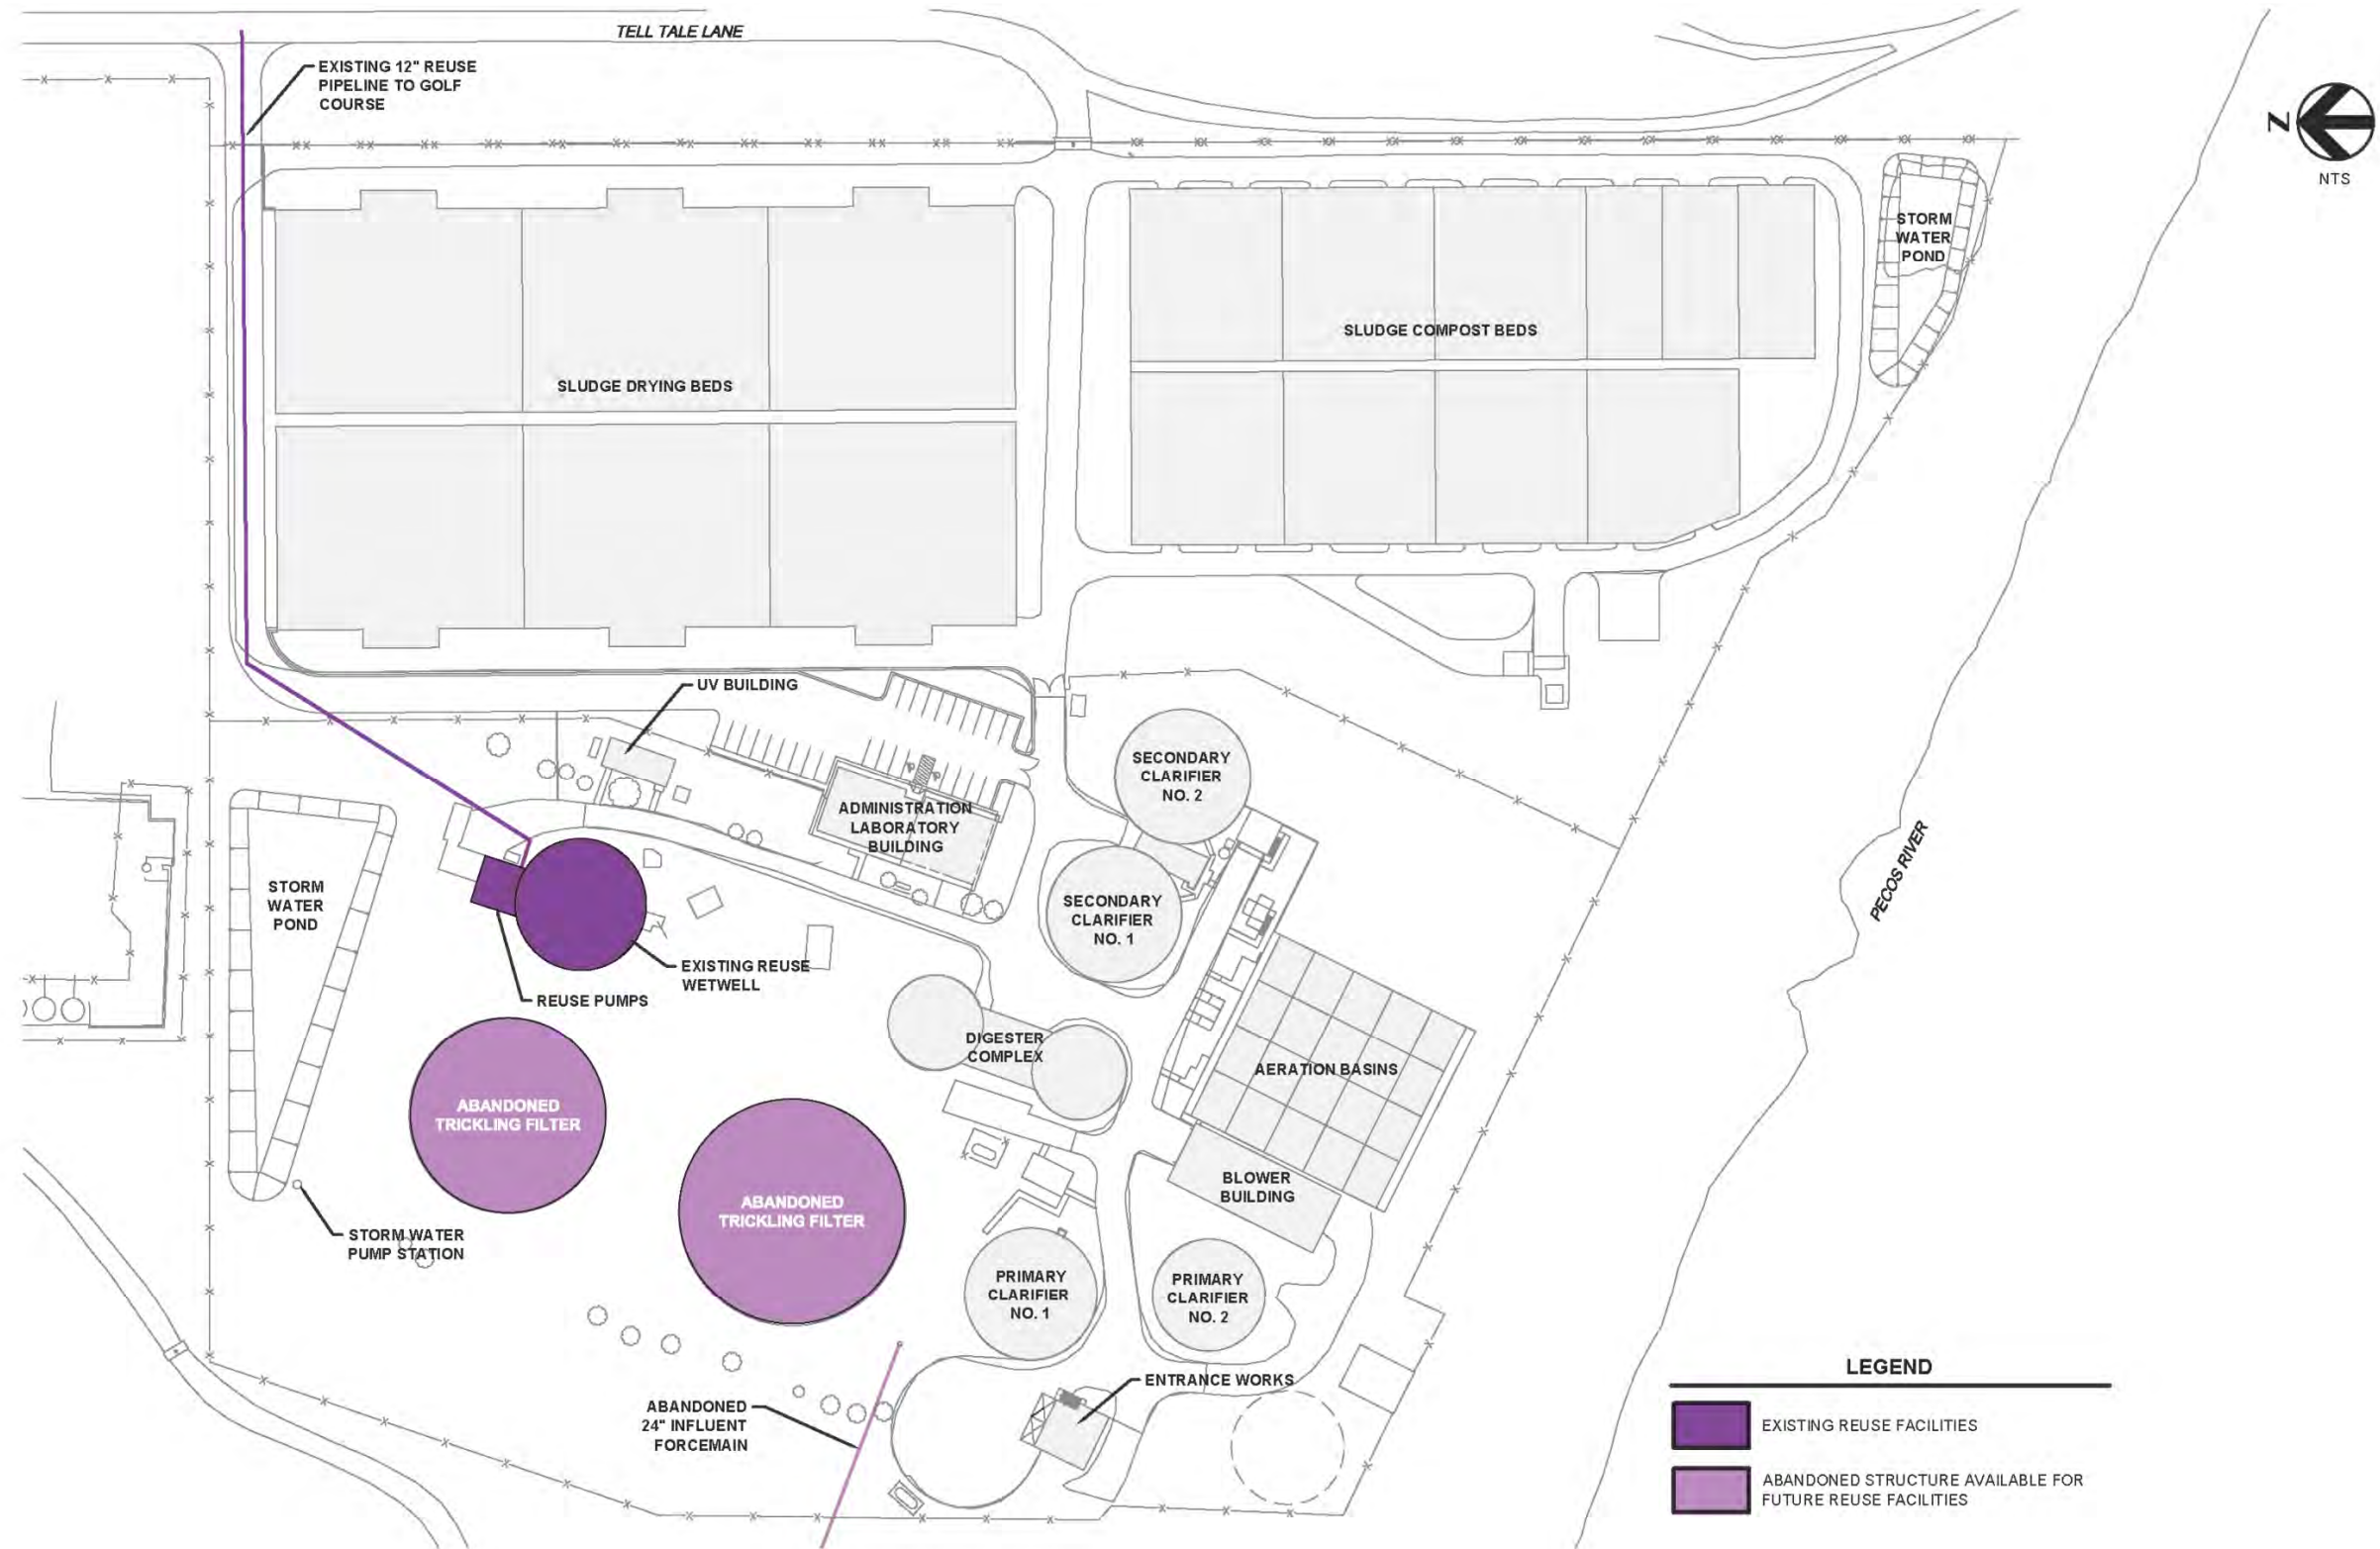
Site Plan of Existing Wastewater Treatment Facility
